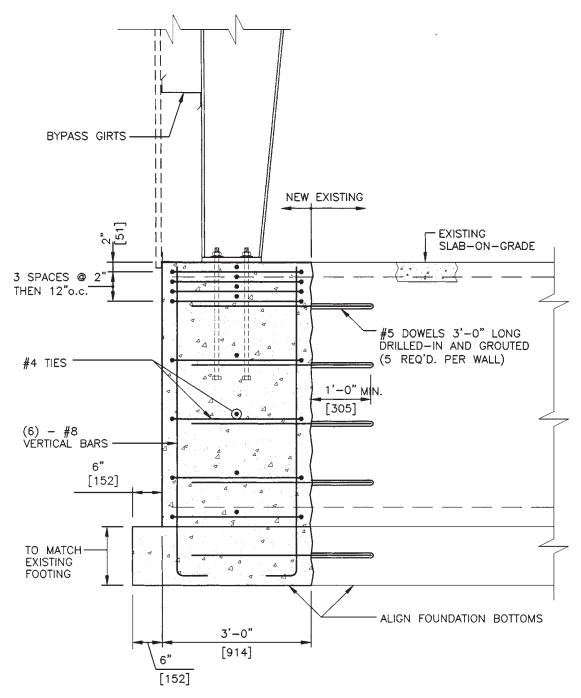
Section through new foundation piers at rigid frame in the Case Study.
